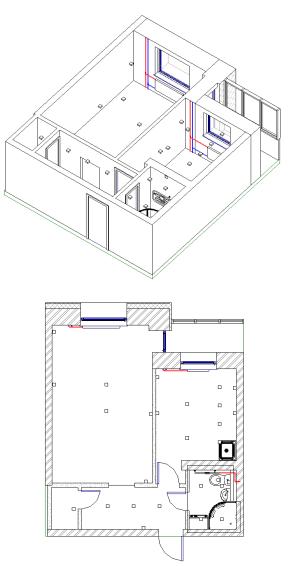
3D view (left) and plan view (right) of the sample apartment
